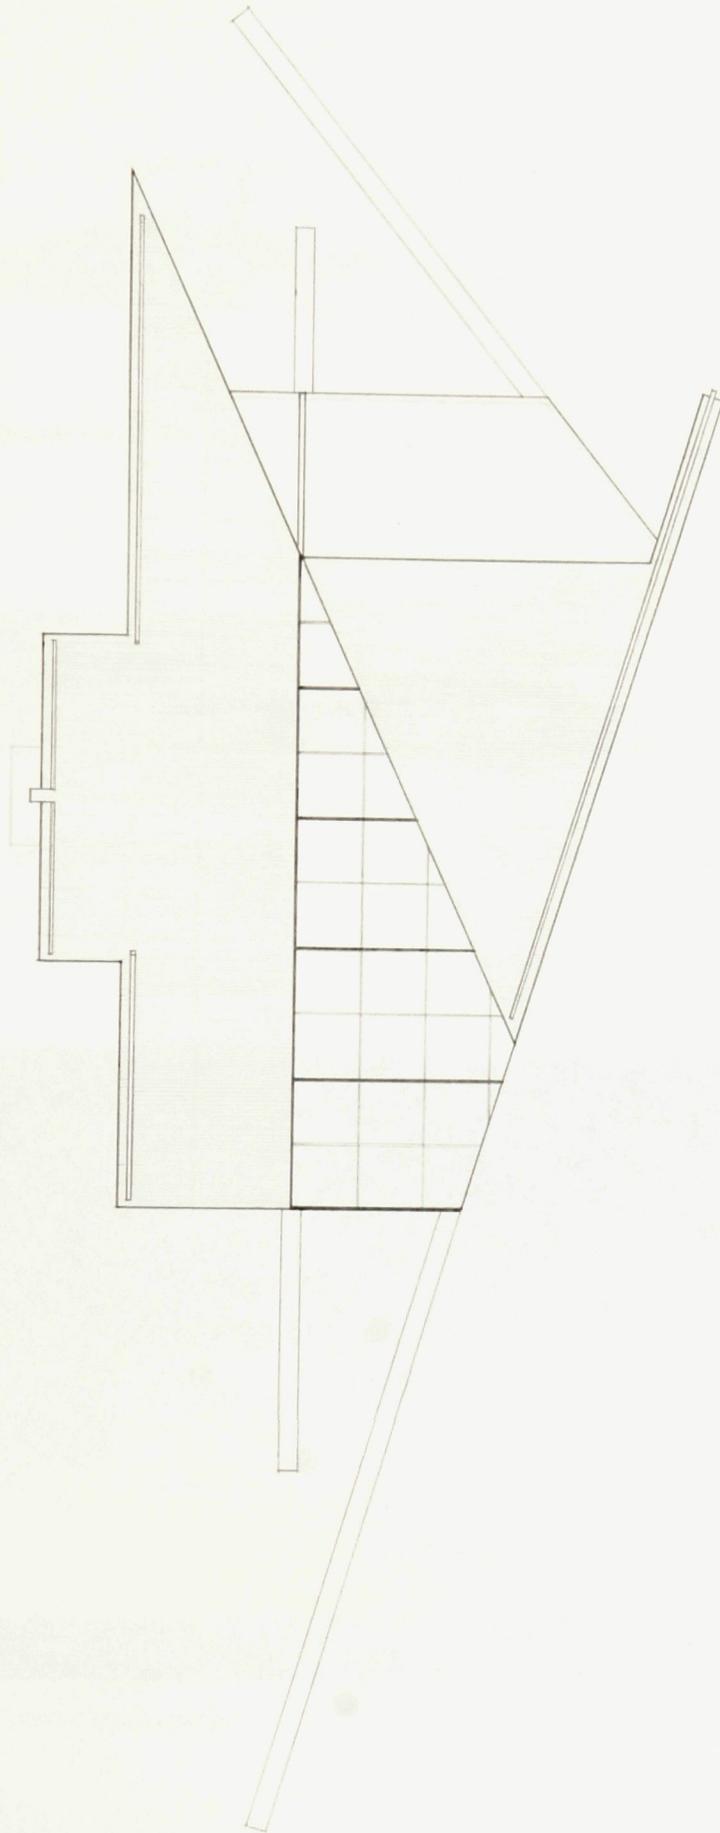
Pavilion: Roof Plan*, graphite, original 12" x 23" @ 1:100, 2008. Created by author.
